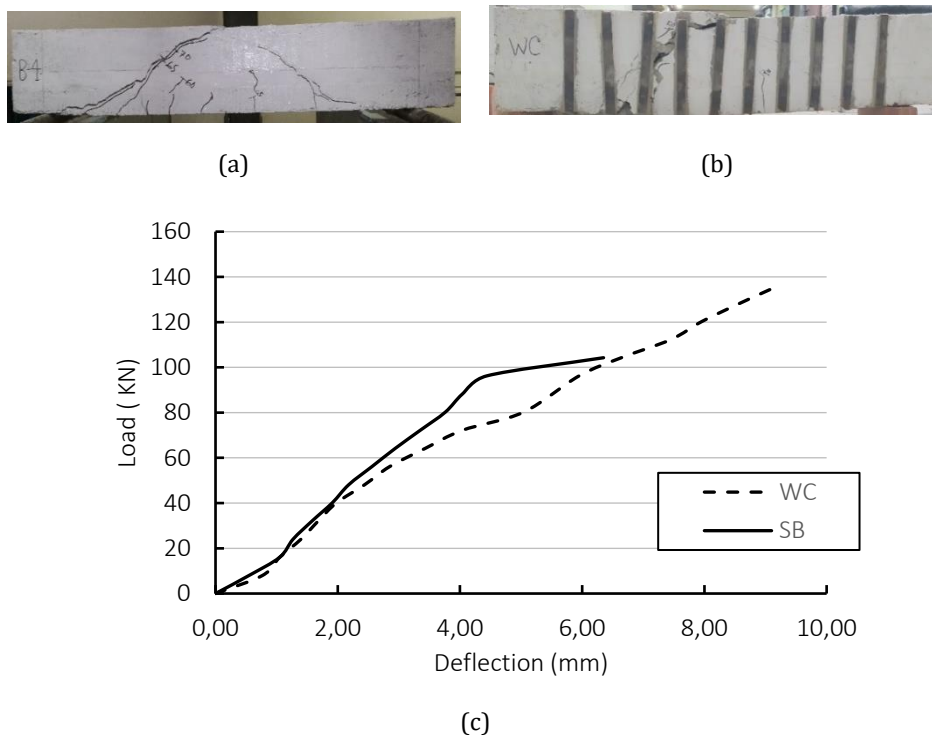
(a) Damaged beam for WC, (b) Failure mode of beam WC, (c) Deflections of beams WC and SB
